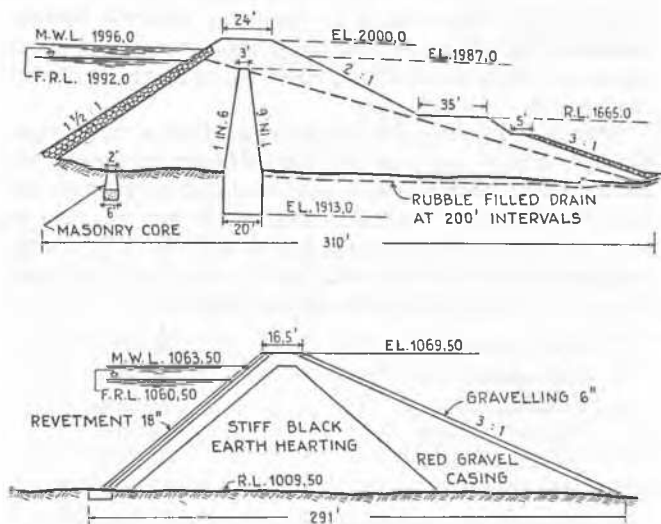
Typical Cross Sections through Ancient Earth Dams
